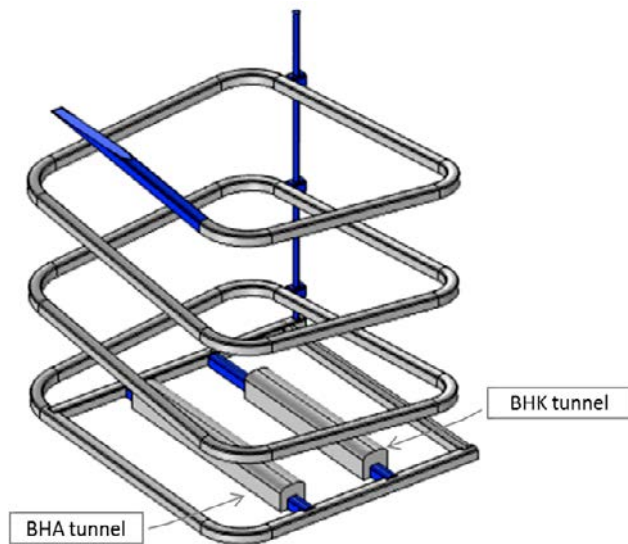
Sealing sections (blue) installed at closure in the tunnel sections connecting the vaults and access tunnels, the vertical shaft and in the access ramp.
